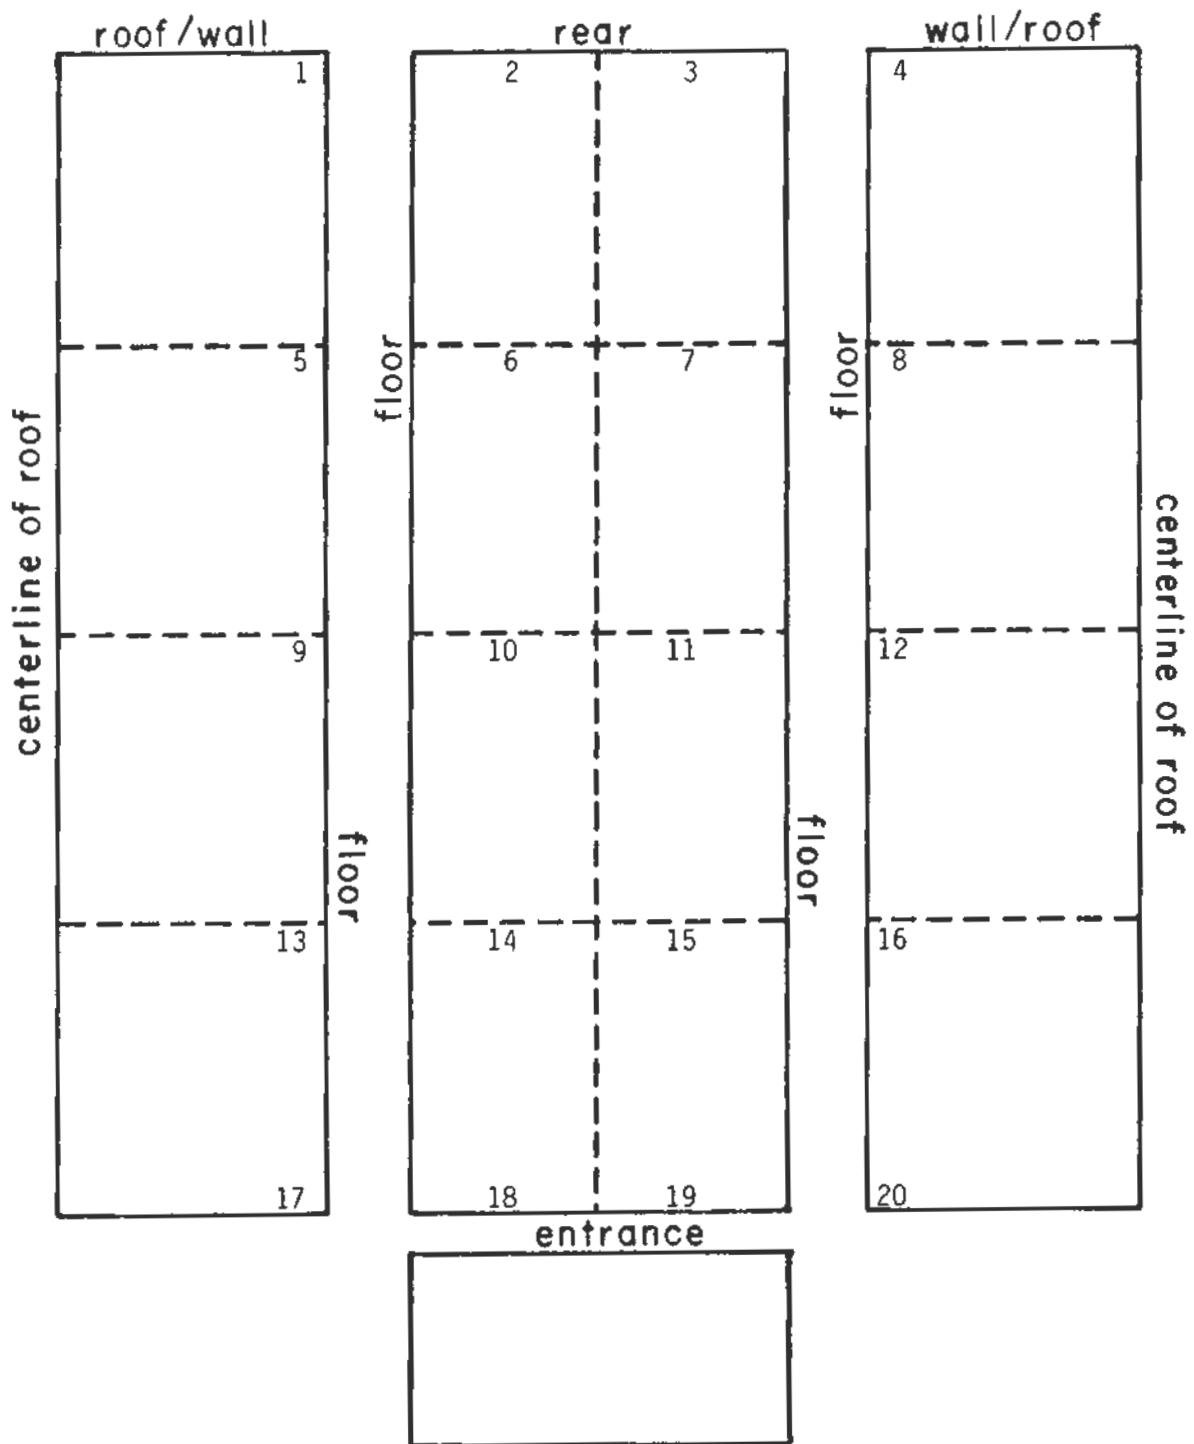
First Team Surveyed Positions: Building B03 (Interior)
